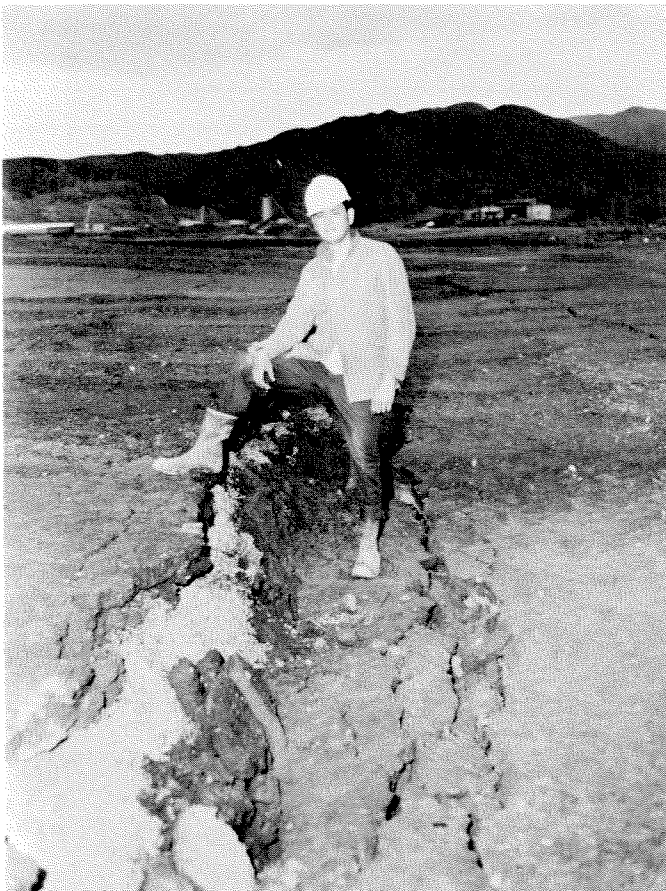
Looking north along eastern edge of reservoir, showing settlement of filled ground.
